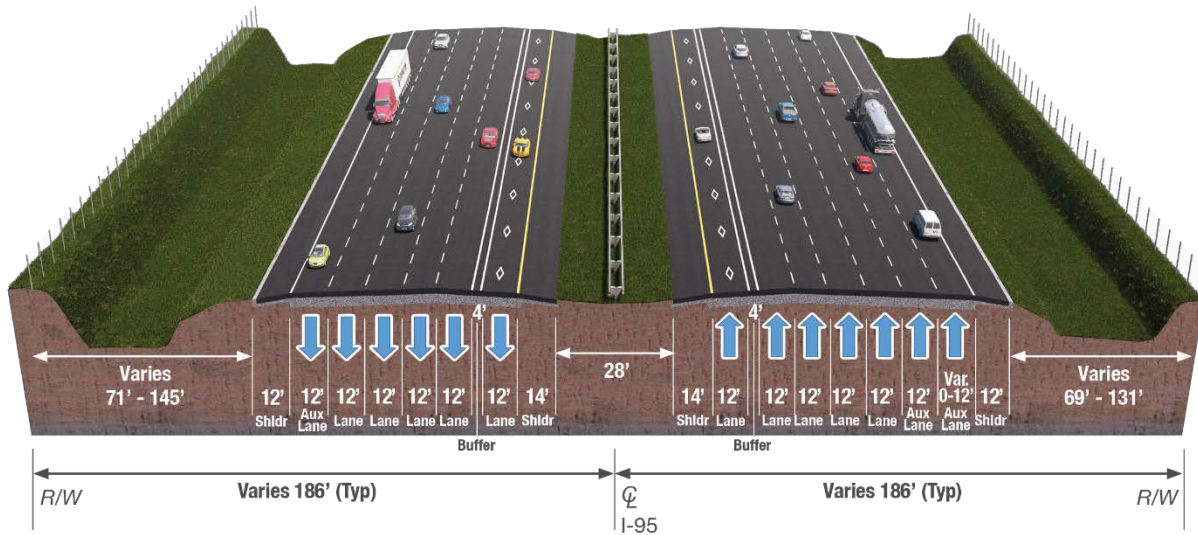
Typical Section – I-95 South of Central Boulevard (Mainline Alternative 2)
